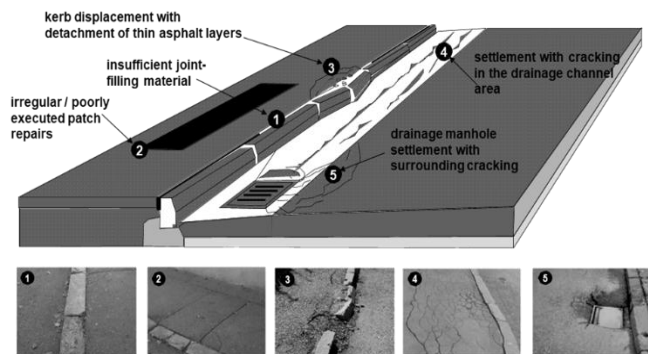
Types of kerb damage affecting pavement structures made of cobblestones and slabs
